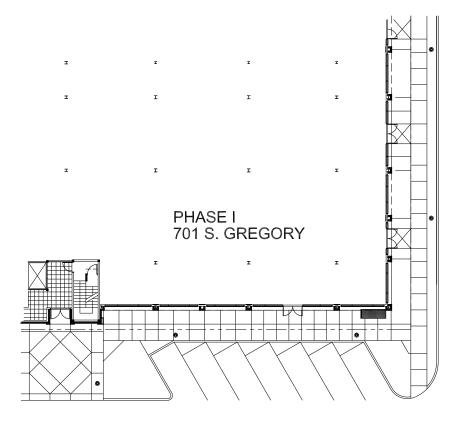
EXHIBIT D <u>SITE LAYOUT AND ELEVATIONS</u>
